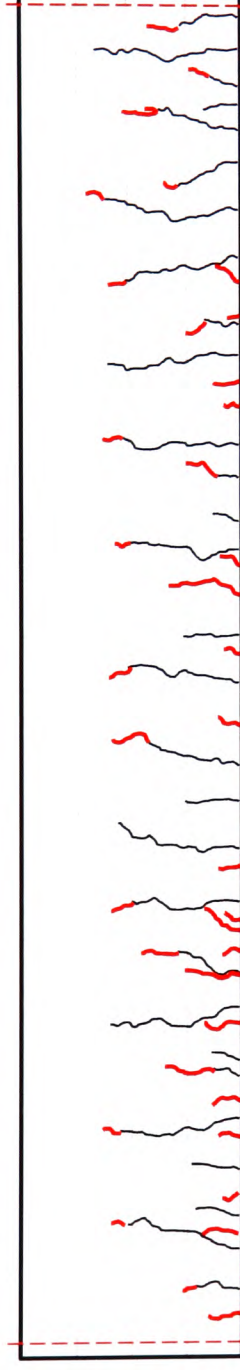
(b) – Schematic of crack pattern for 8CF3 within constant moment zone at failure
